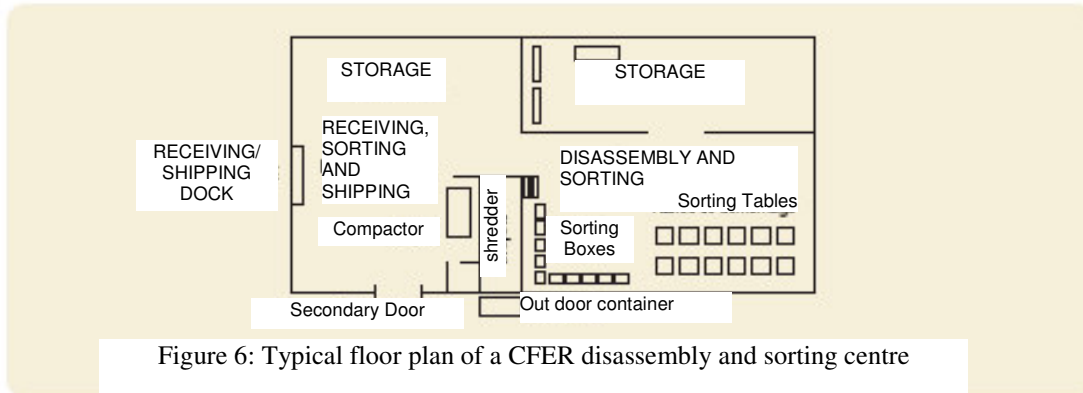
Typical floor plan of a CFER disassembly and sorting centre
